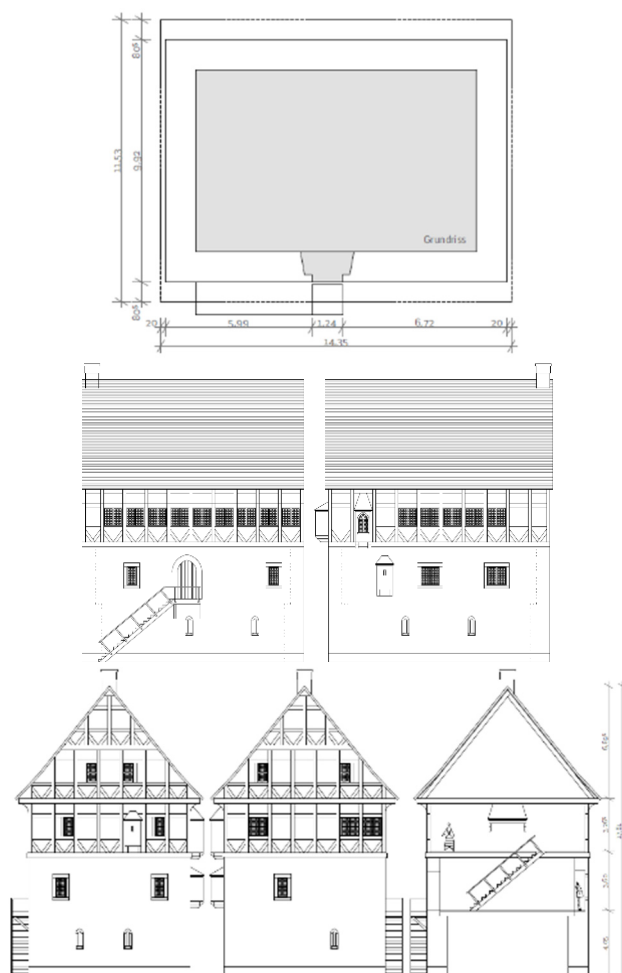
2D architectural drawings (ground plan and facades) of the residential tower of the Horneburg Castle (© Reunion Media, Emden, Germany; Mennenga, 2020).
